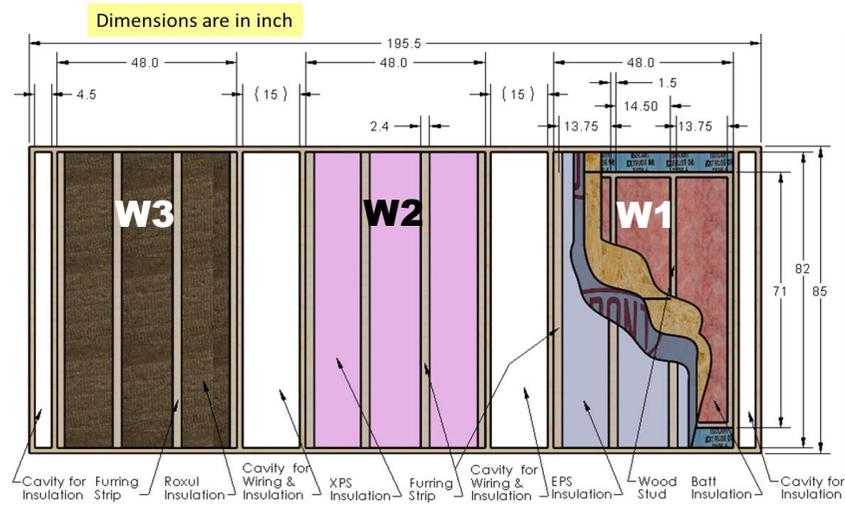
Schematic of three 38 mm x 140 mm (2 x 6 in.) wood-frame wall (residential) test specimens installed side-by-side in FEWF
